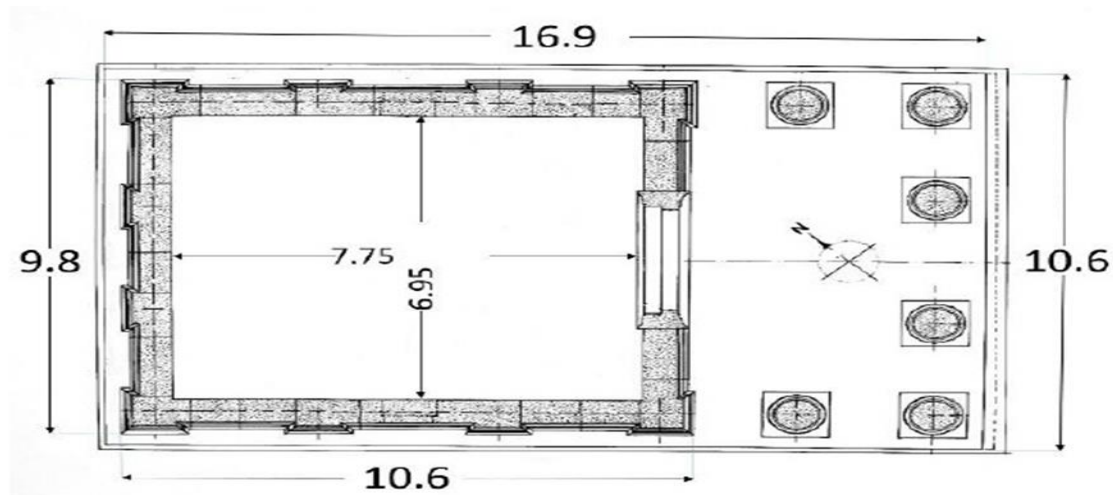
Plan of the main building of the Temple of Baalshamin (dimensions in m)
